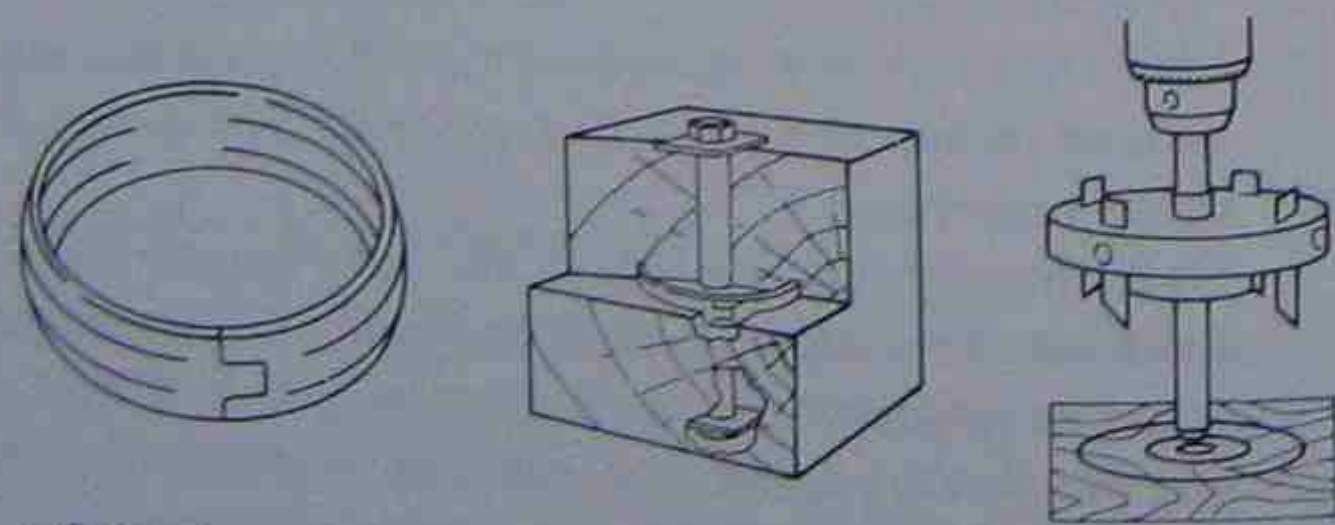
Split-ring connector and grooving tool (also used with shear plate connectors)
